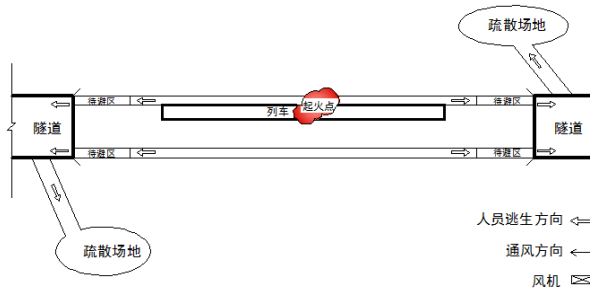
Schematic of layout planning in subgrade connecting adjacent railway tunnel
